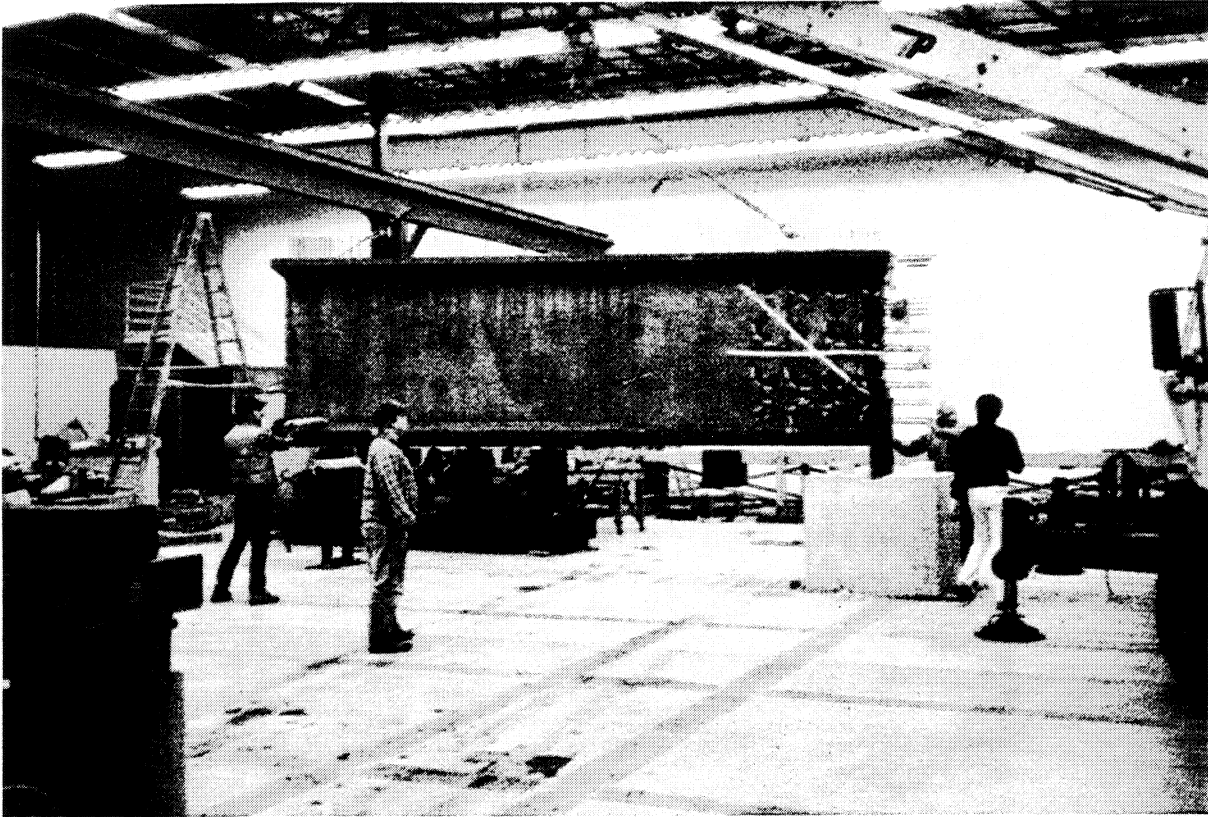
Laboratory Test - Erection of Girder A on the Pedestal
